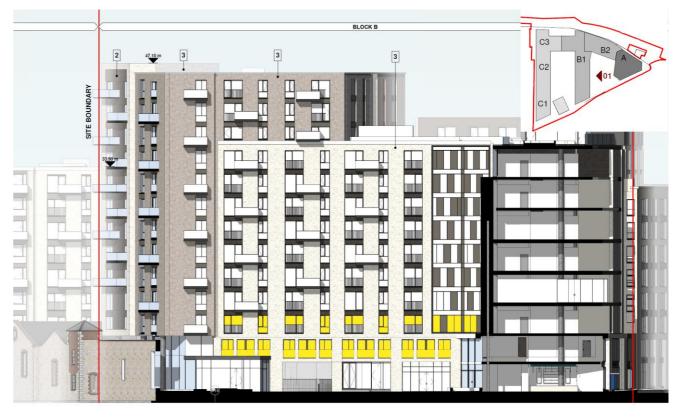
Sample Units on Mezzanine and First Floor of Permitted scheme that have been assessed for impact due to new tower massing.
